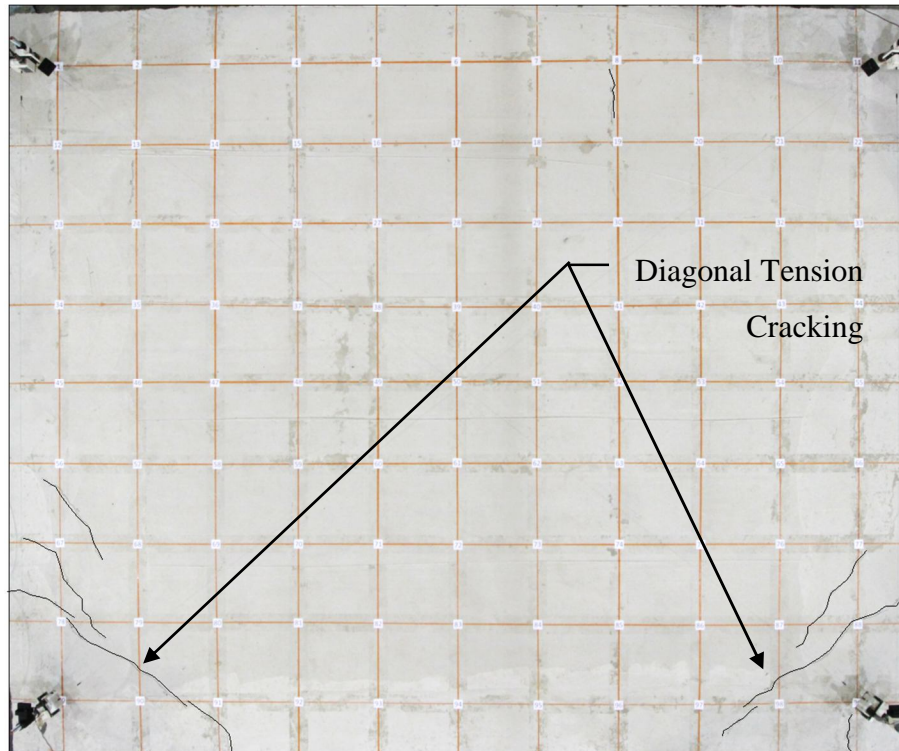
Crack Distribution of Specimen 3/7.5-4-N-NF-RS First Occurrence of Diagonal Tension Cracking (Point B in Figure 3-59)
